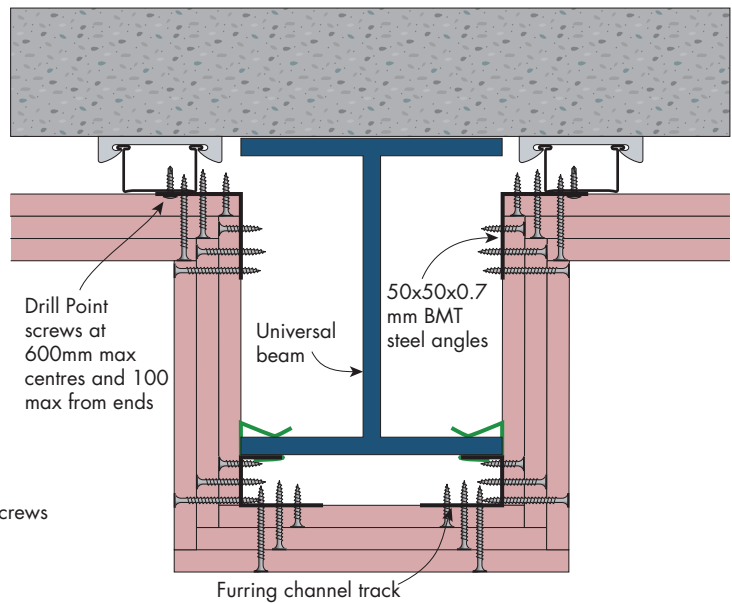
3 Sided Protection for I-Beam to Ceiling
